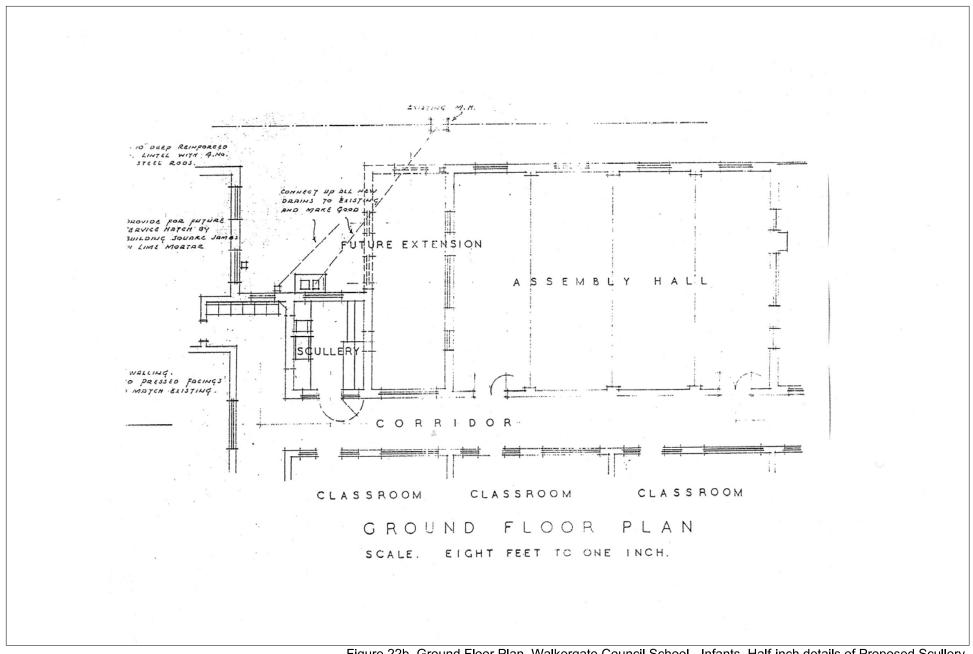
Ground Floor Plan. Walkergate Council School - Infants. Half-inch details of Proposed Scullery August 1943. F.W. Harvey, Education Architect for Newcastle-upon-Tyne Education Committee
